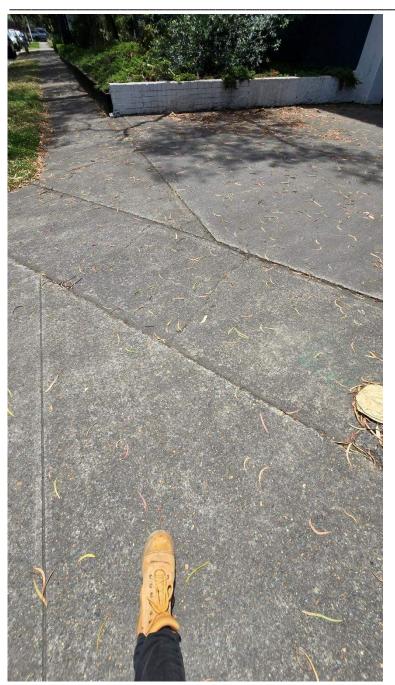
Cracks observed (19) - Poor condition of driveway, cracks and joints
